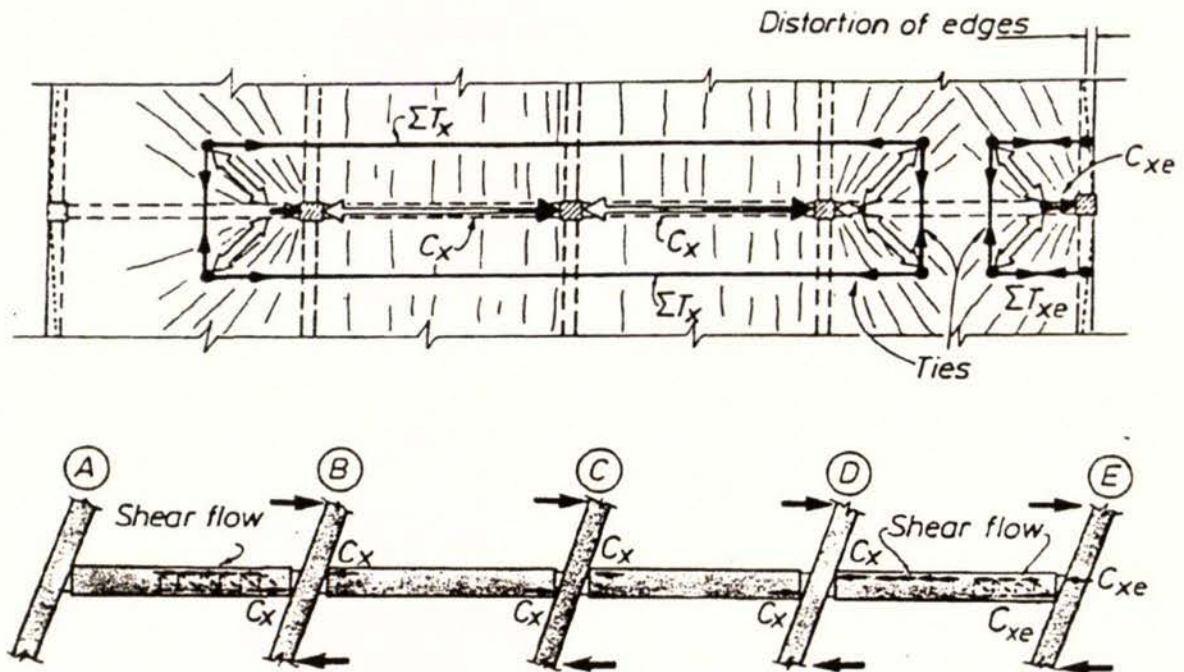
Strut and tie mechanism in floor slab [C2].
